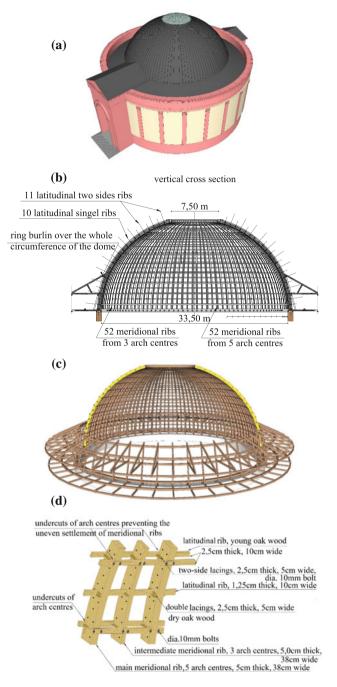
The Moller G.'s Dome in Darmstadt, Germany, of a 33.5 m span according to [13], a view of the Saint Louis Church in Darmstadt, b vertical section of the structure, c visualisation of the dome' structure, d details of the connection of the dome's meridional and latitudinal ribs
